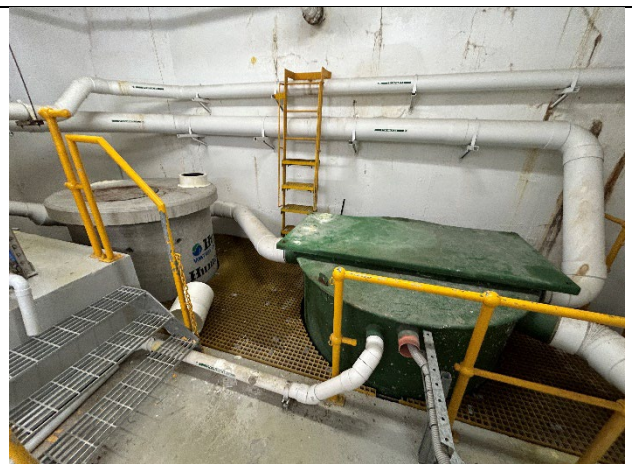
Level B2, Stormwater Pump Room, sump pump pits x 2.
